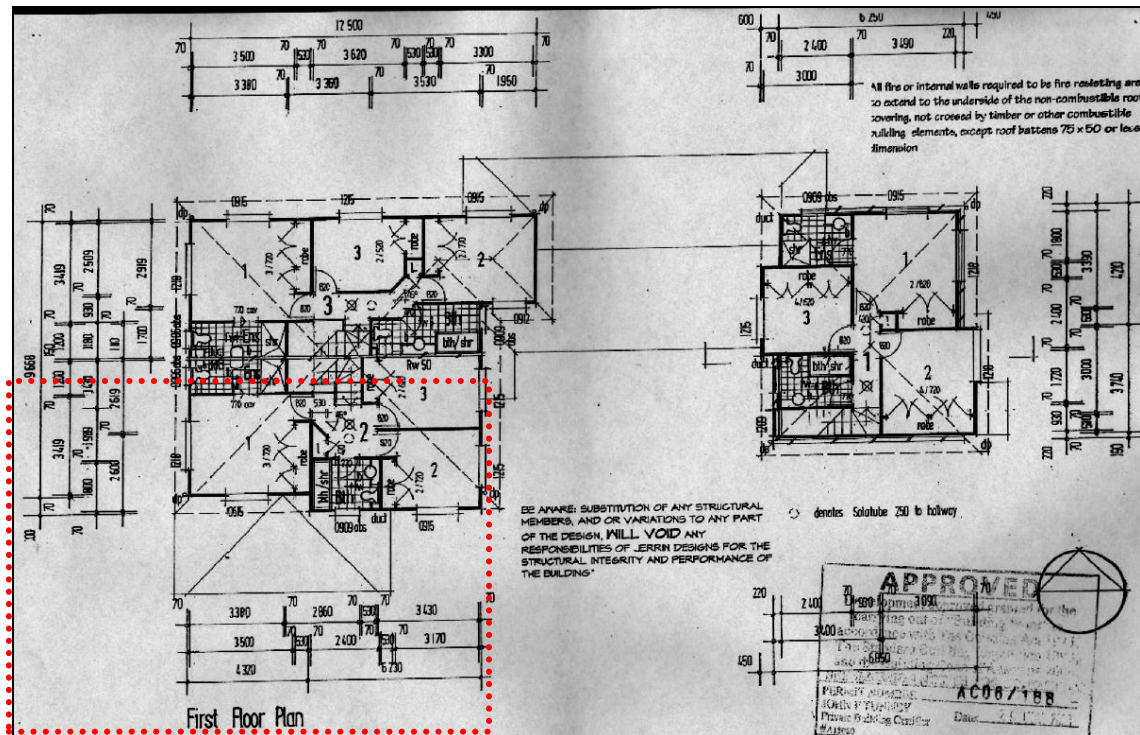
Case study house drawings for upper floor (unit 2)
